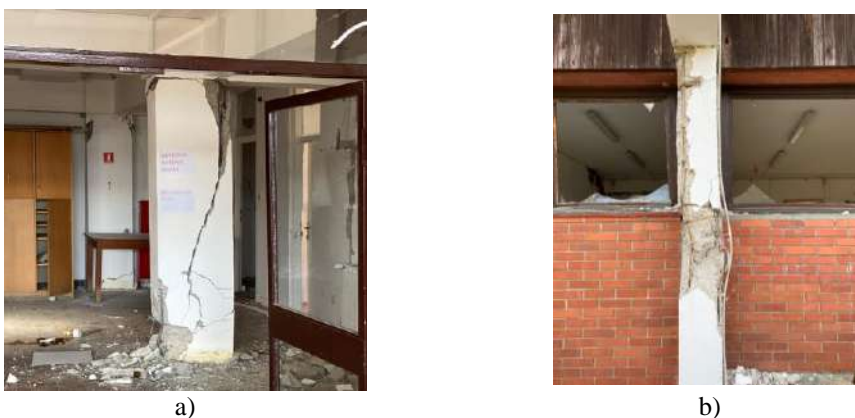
Damage in the former elementary school in Donja Bačuga: a) shear failure of an interior column and b) a “short column” failure of an exterior column
